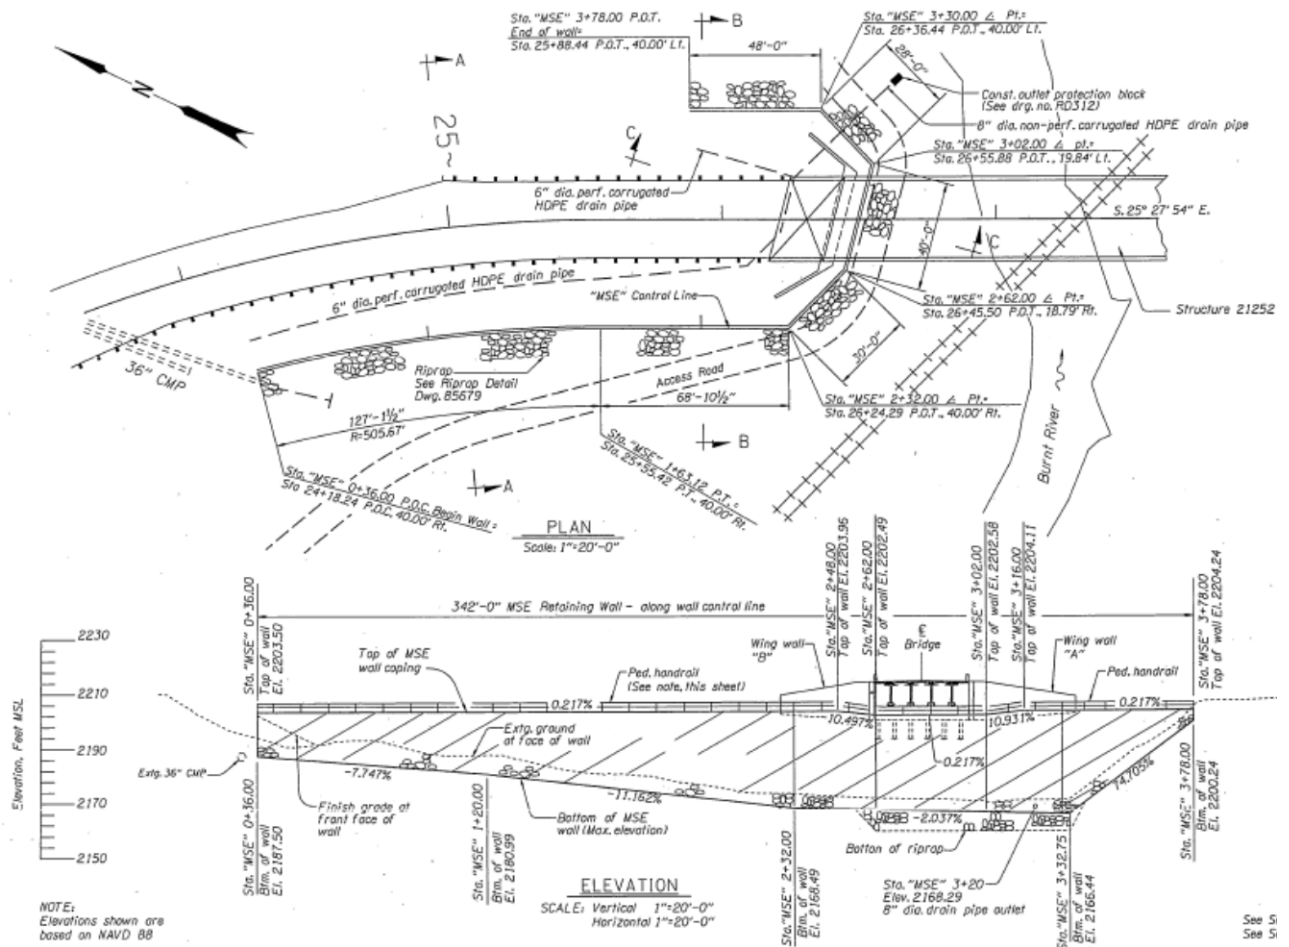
Diagram. MSE wall plan and elevation views for bridge 21252.
